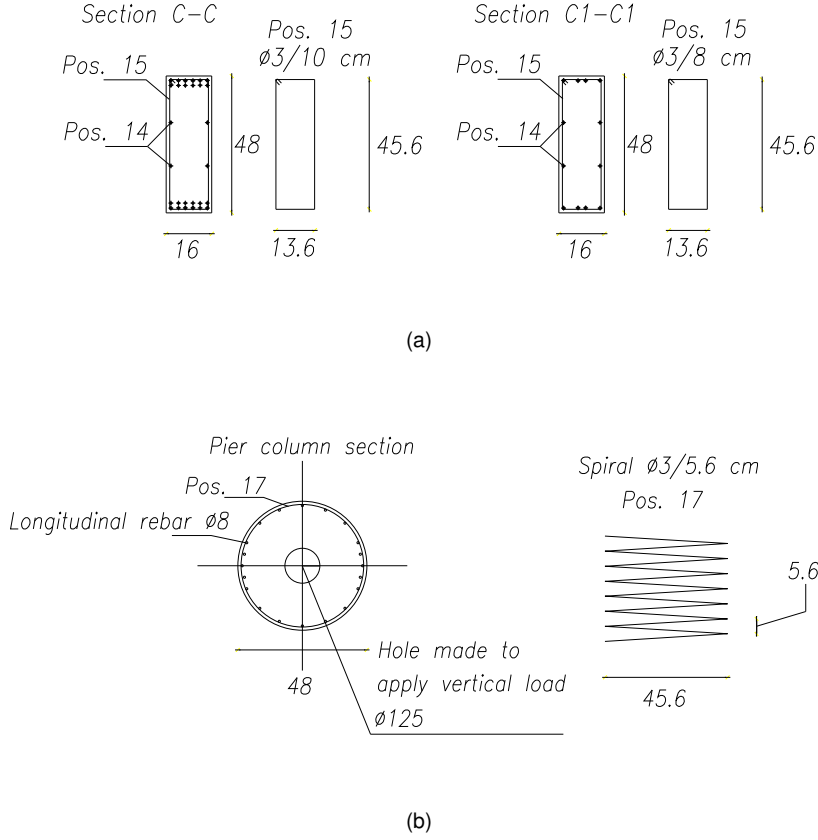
Details of the reinforcements of Pier #11: a) Transverse beam stirrups; b) Column reinforcements.
